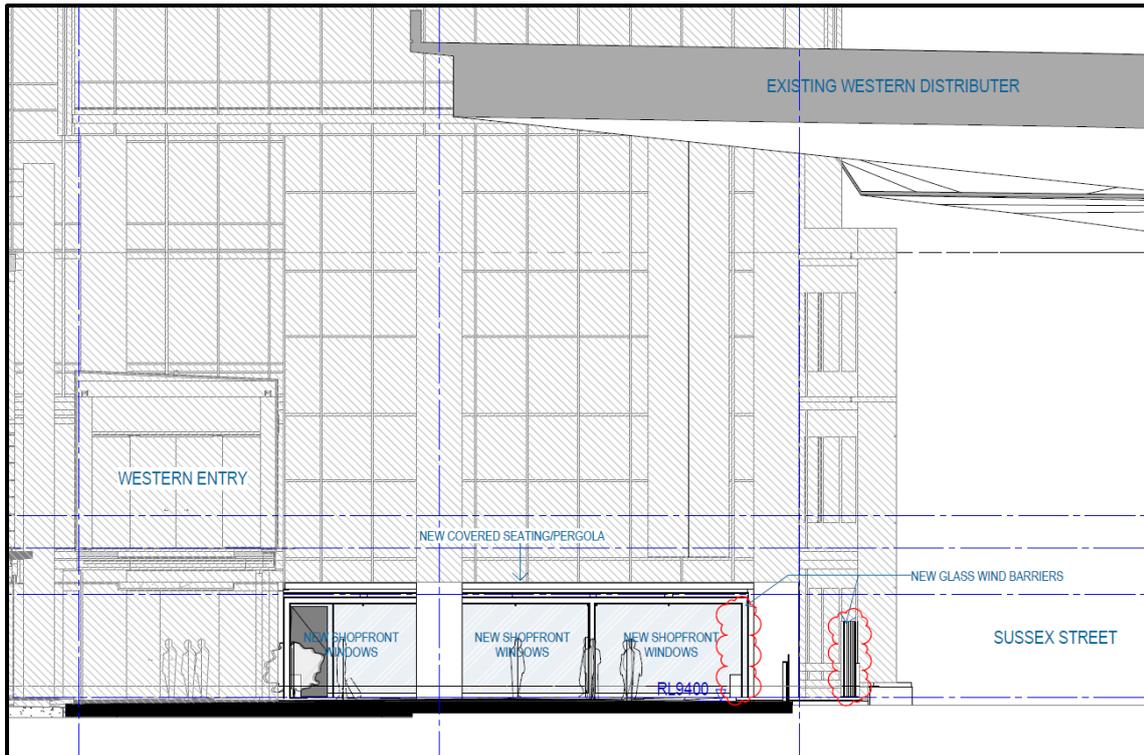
Northern elevation (Urban Park level, floor level above Sussex Street).
